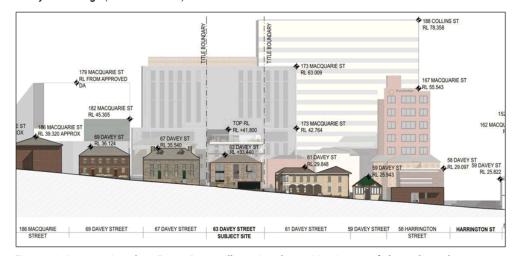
Long section along Davey Street, illustrating the positive impact of the podium element, reintroducing and reinforcing a key element within the streetscape (source: JAWS Architects)
